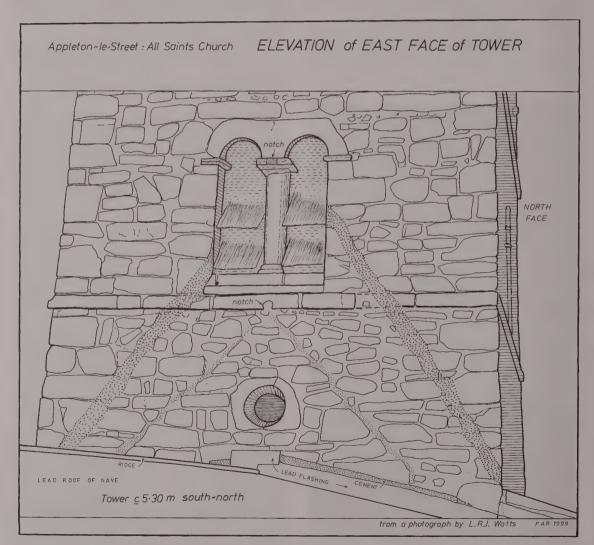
Elevation of part of the east side of the tower above the nave roof (drawn by PAR from LW photos)
